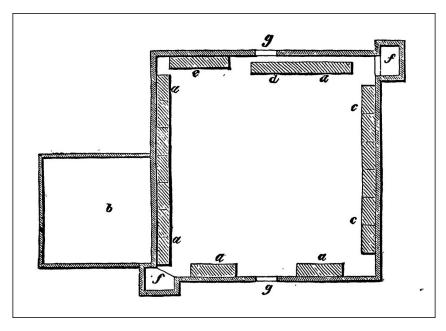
Prince Maximilian's 1833 sketch of Fort Pierre showing many of the interior buildings next to the palisade wall. North is to the right.
